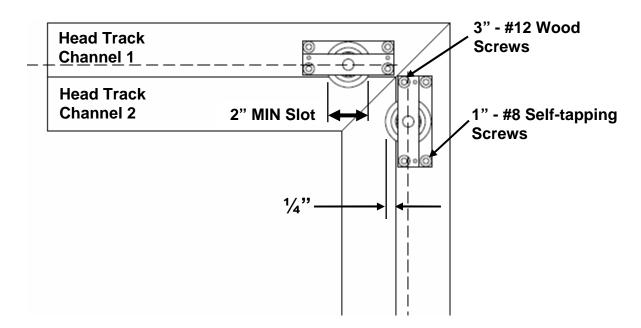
<u>Bottom View</u> of Clearance Needed for In-line Idler Return Pulley Installation on <u>90°Door</u>
